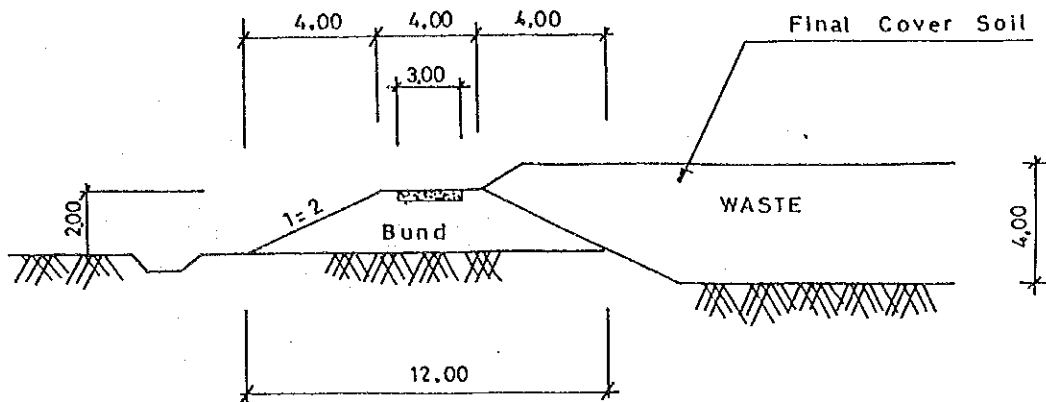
Typical Cross Section of Enclosing Bund
